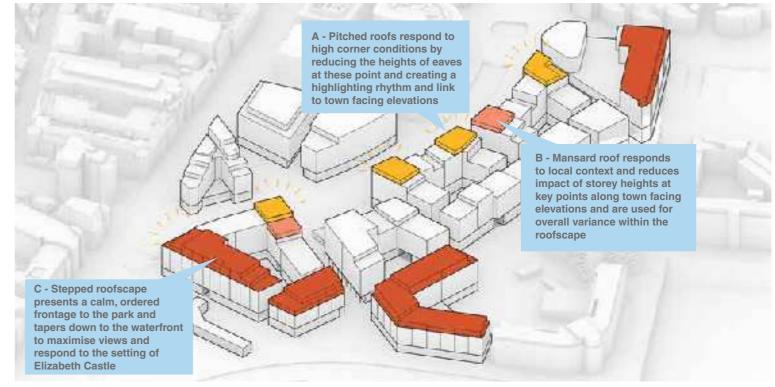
Roof shapes and finishes - Activated roofscapes
